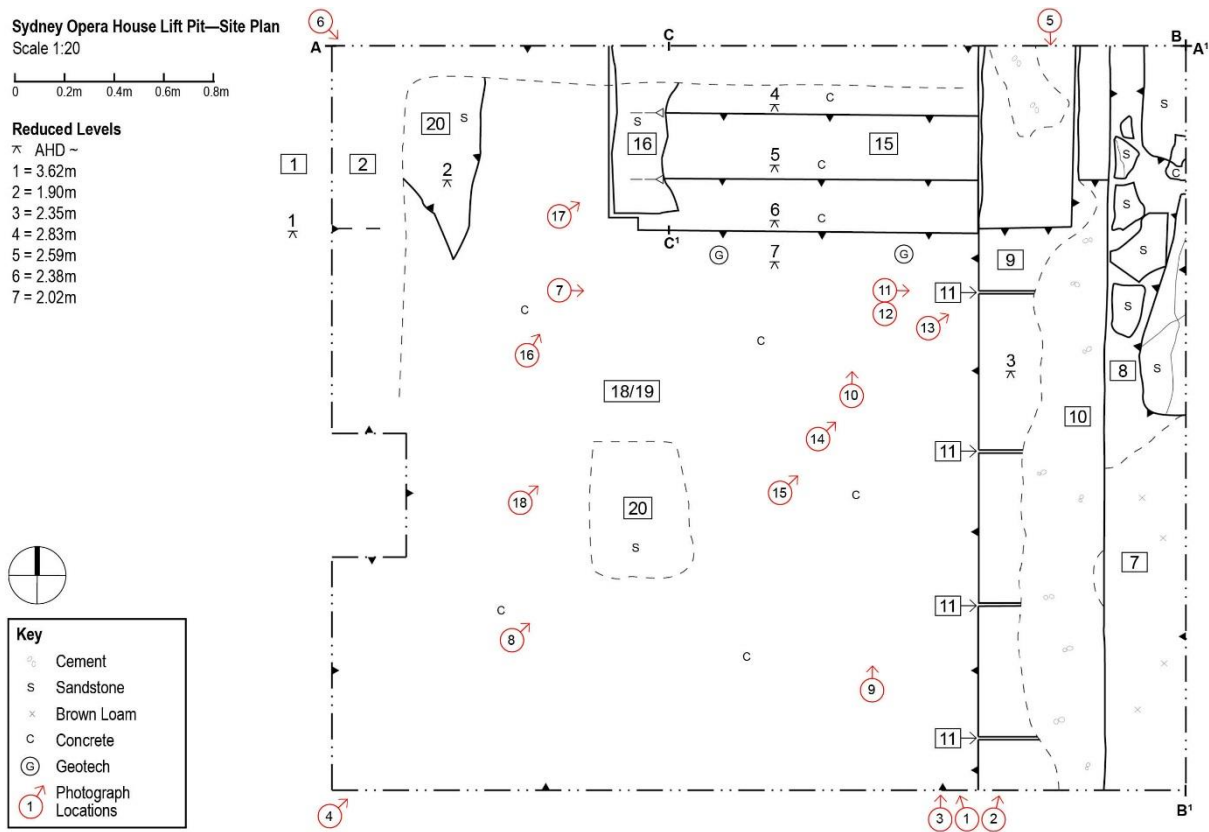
Photographic Plan Sheet, showing the extent of excavation following Phase 1. (Source: GML 2018)
